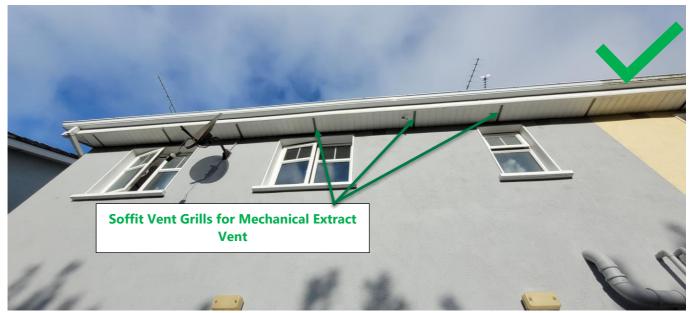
Mechanical Extract Vent ducting to outside of the house where soffit vent grill is installed
